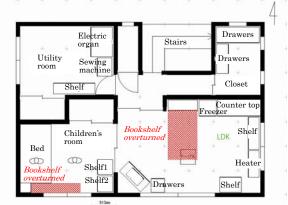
The second floor plan of the house damaged in the Tokachi-oki Earthquake
